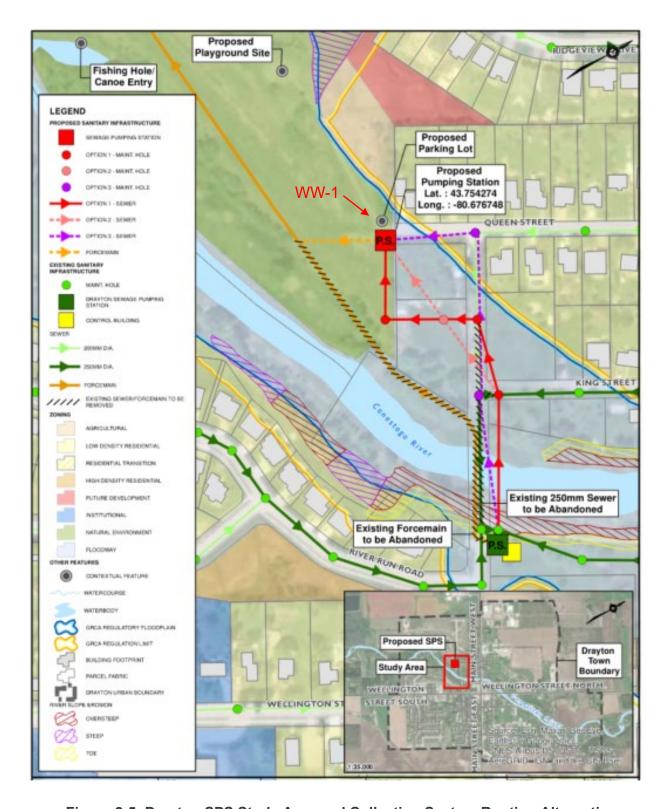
Drayton SPS Study Area and Collection System Routing Alternative
